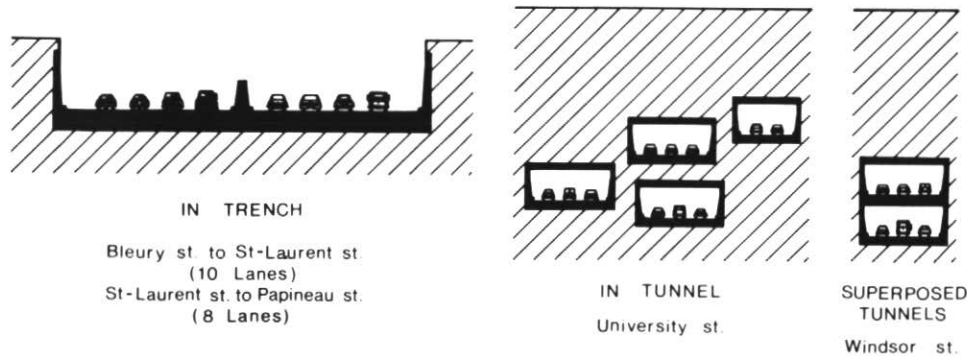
Typical cross-sections of the underground section of the Trans-Canada Highway in Montreal.
